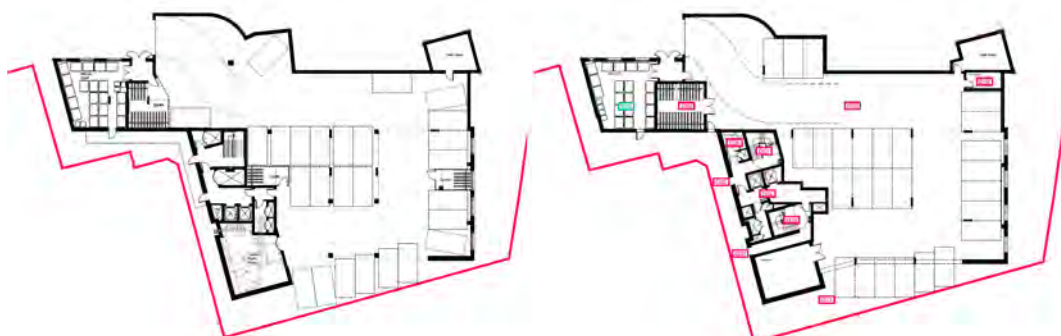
Approved (left) and marked up (right) proposed ground floor plans
